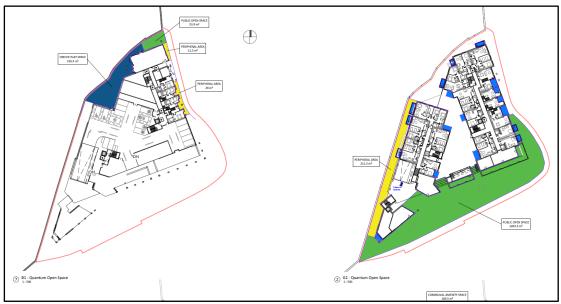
Extract showing the public open space (green) proposed (source: OMP Architects.)
